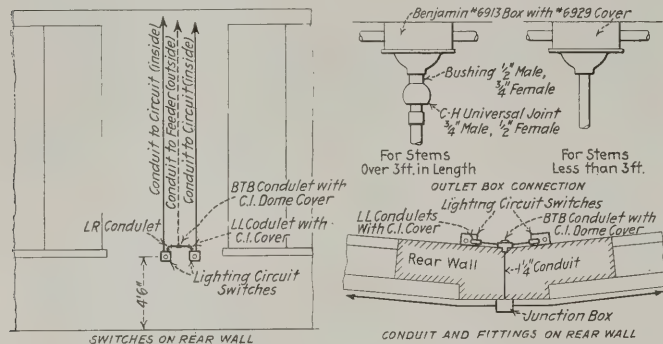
Sketch Shows Methods of Running Conduit and Mounting Lighting Fixtures
